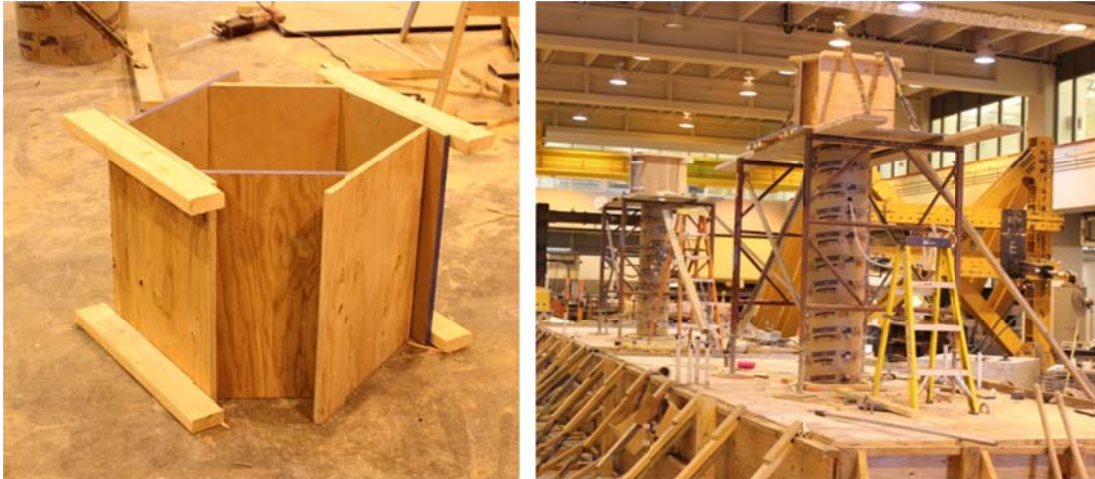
Special hexagonal formwork for the column head (left); and overview of the complete formwork and scaffolding for the columns and column heads (right)
